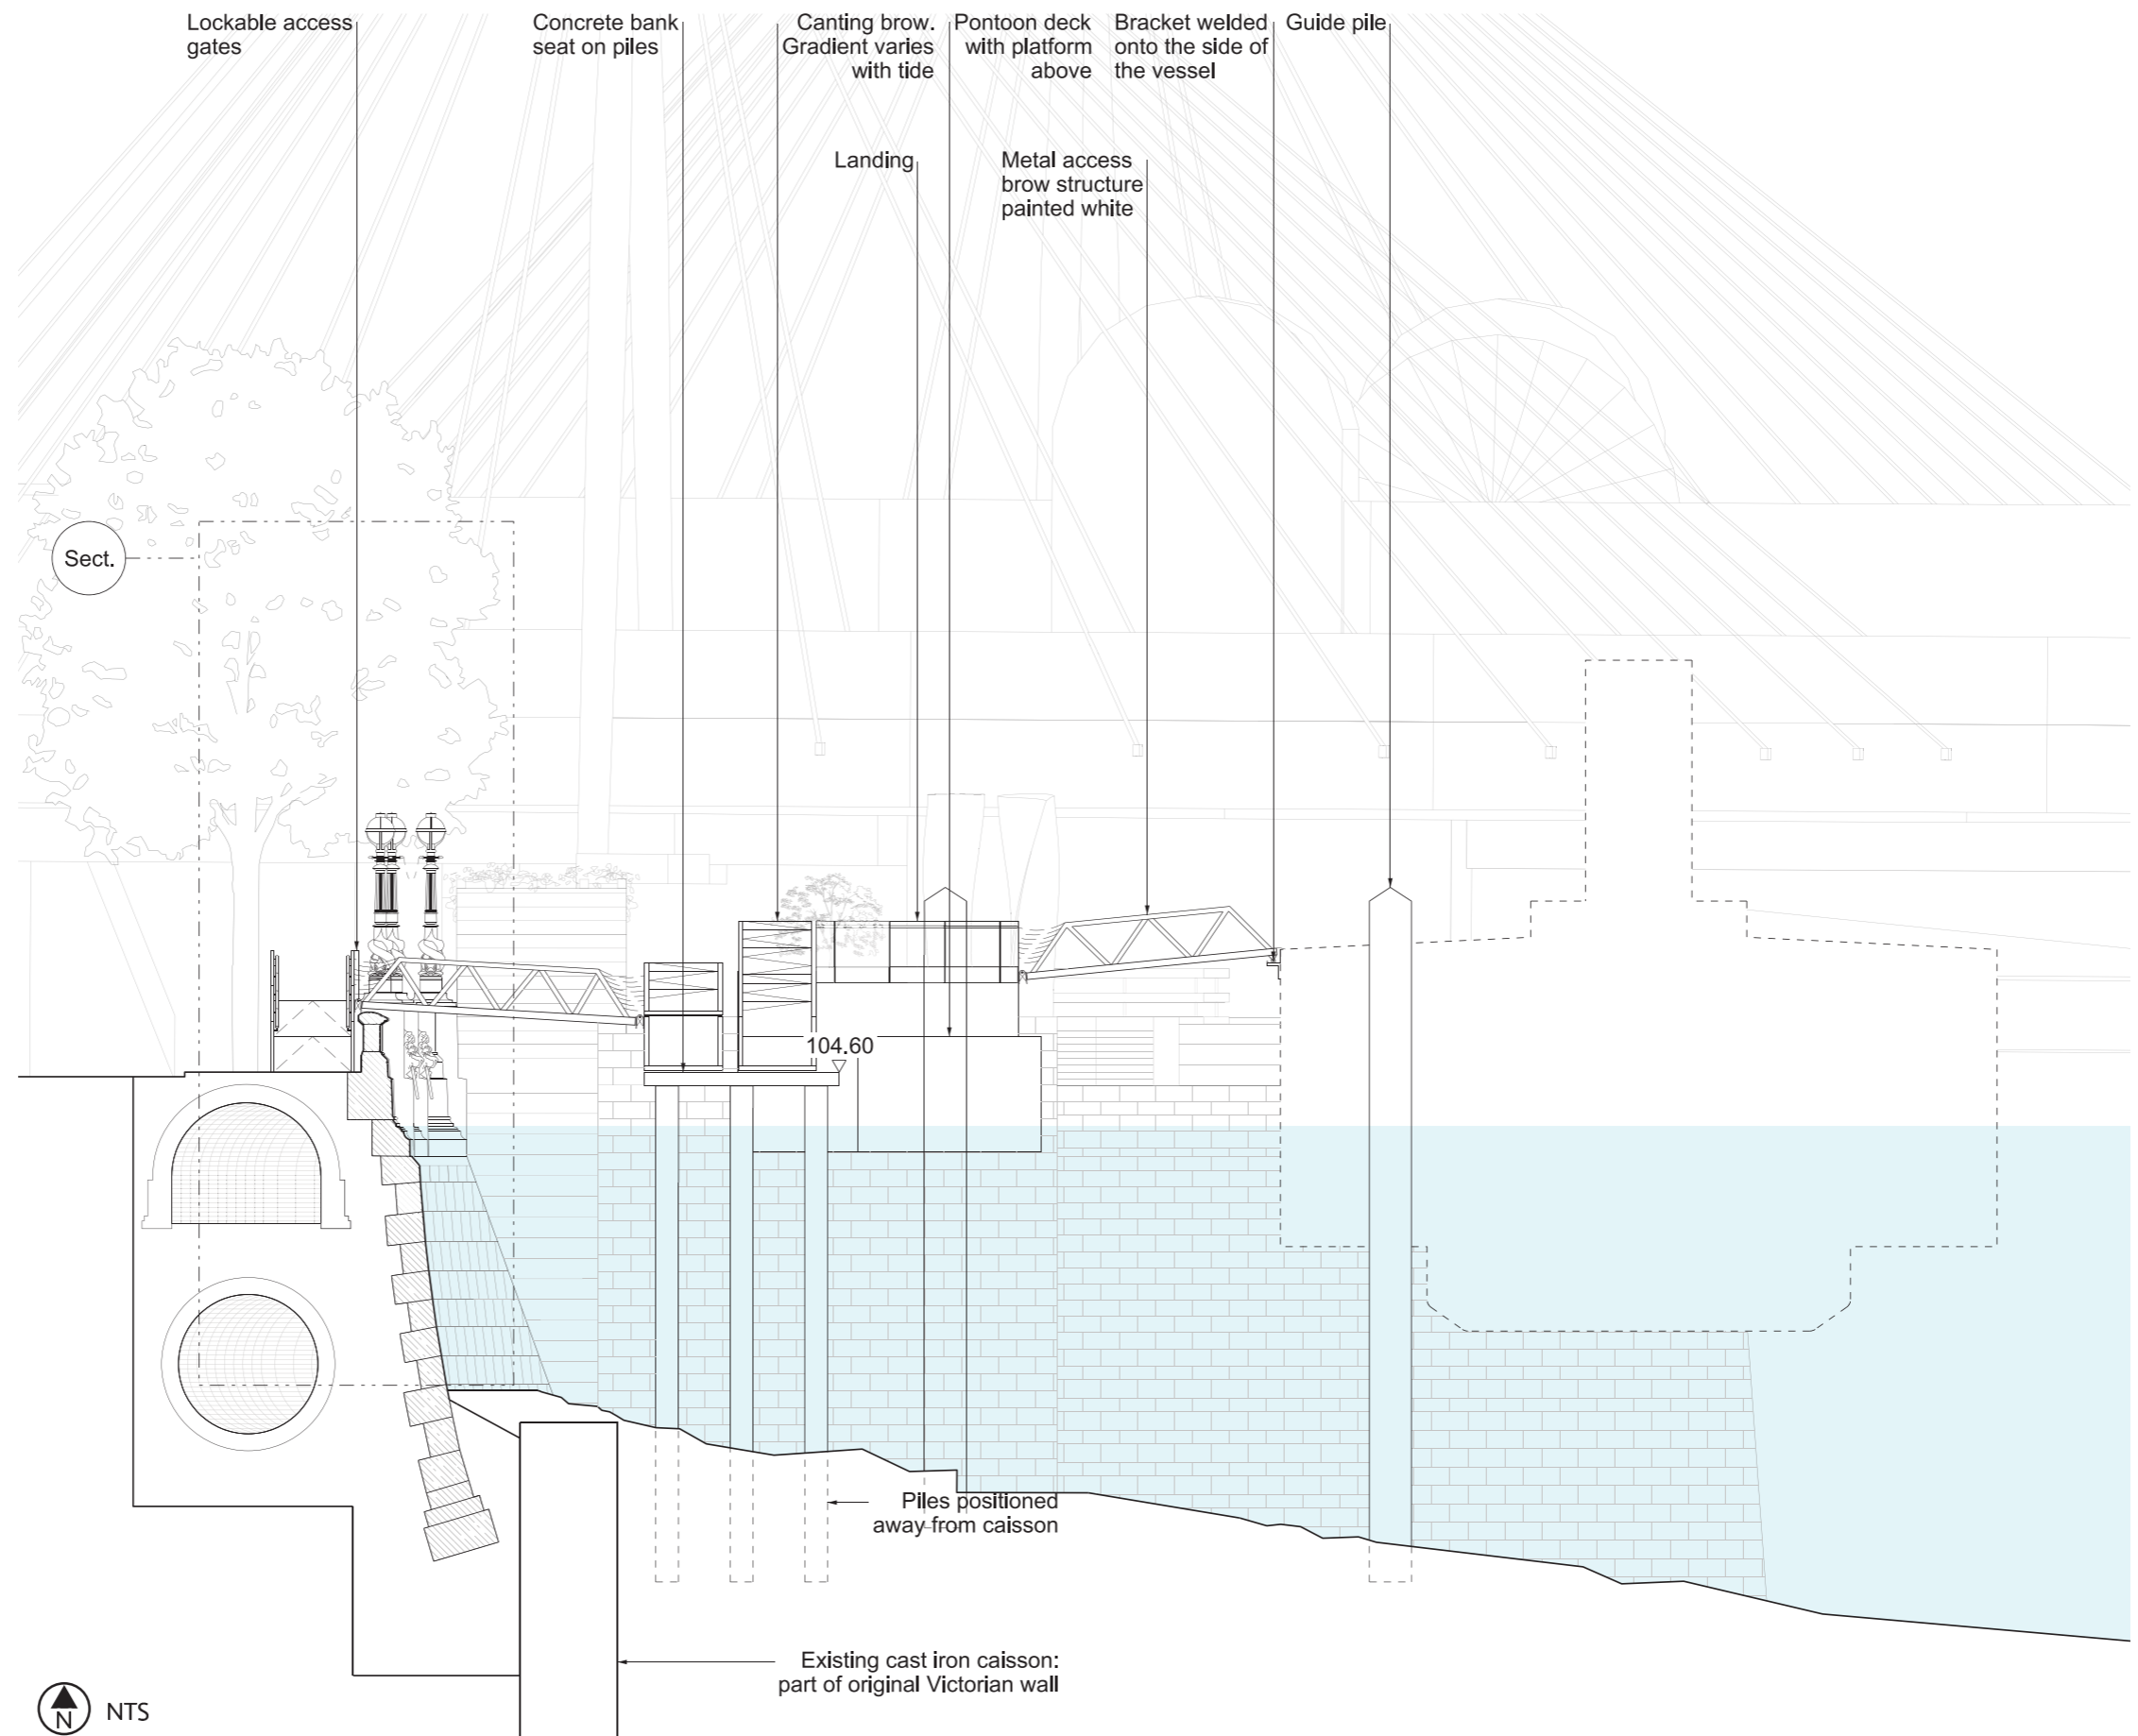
Proposed mooring access details - refer to Proposed mooring access details in the *Book of Plans
